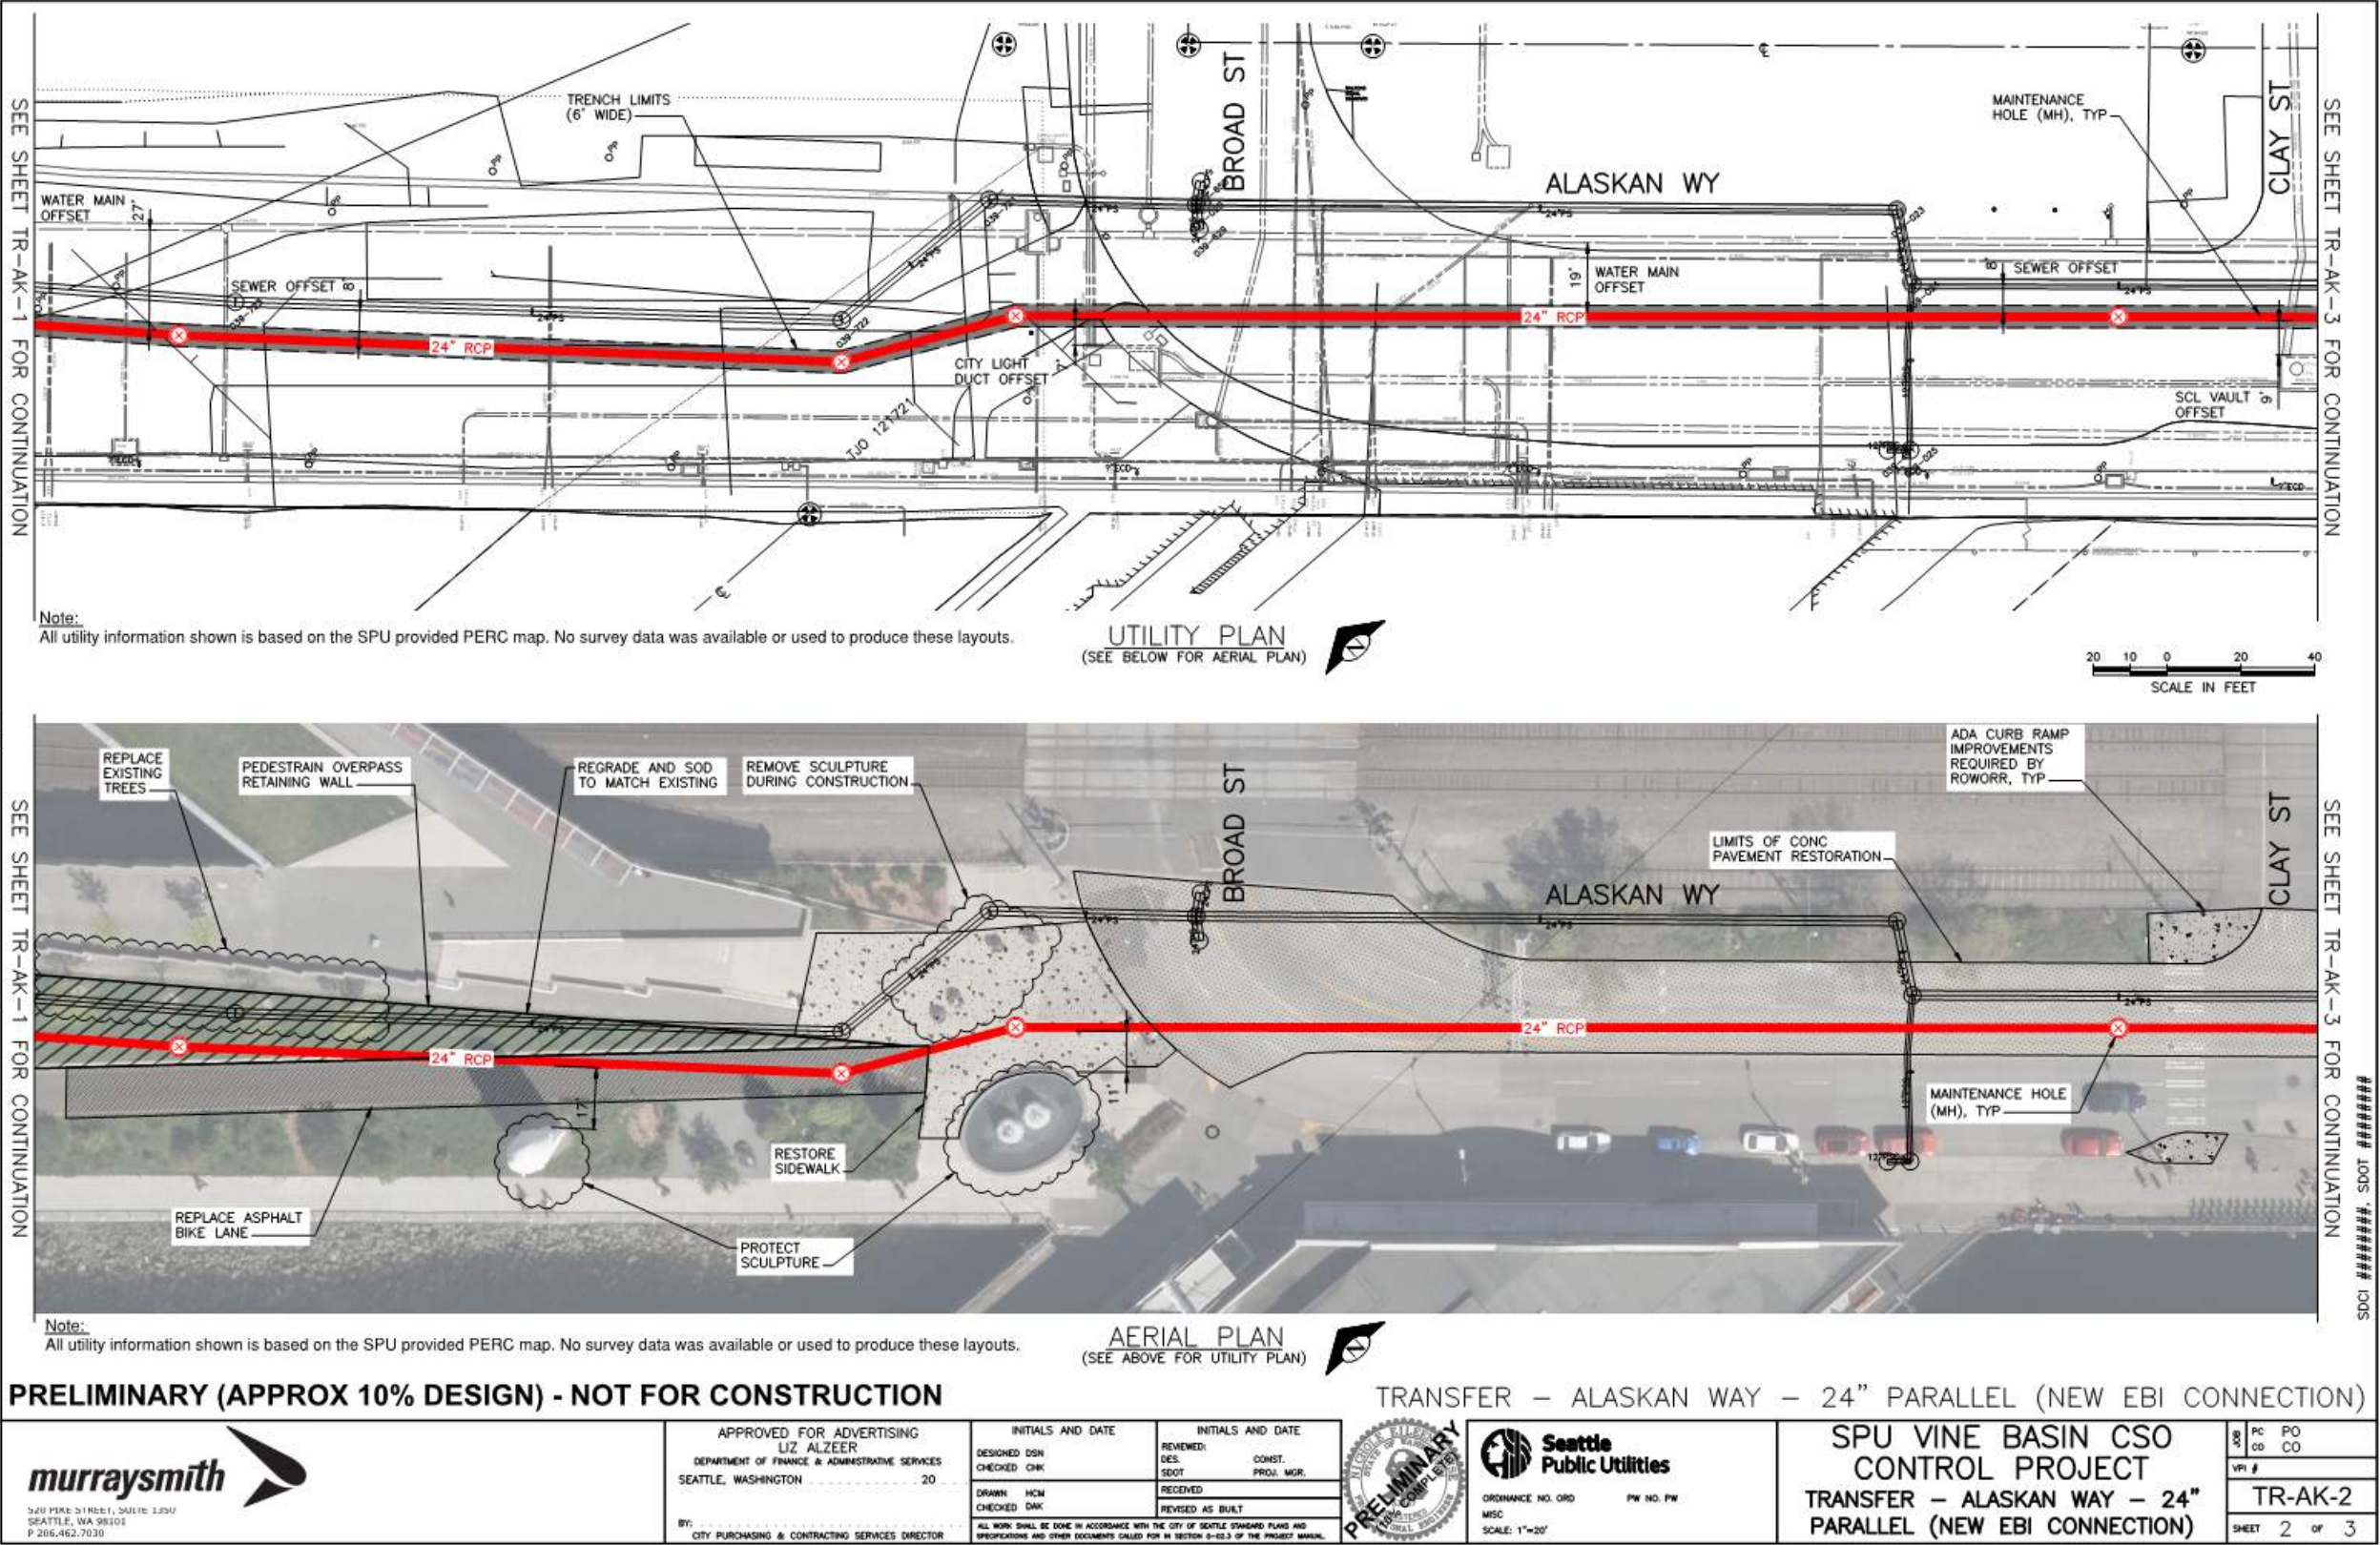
A 9-2B and 9-2C show the utility plans and the aerial plans of the proposed sewer alignment starting from the downstream connection to KC's Elliott Bay Interceptor.
